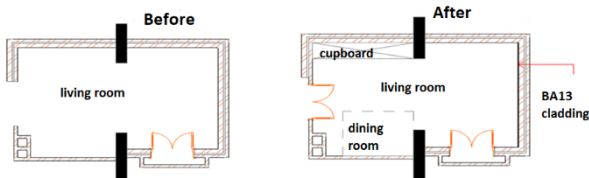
Second configuration: cupboard and dining room layout. (Source: Authors, 2023)
